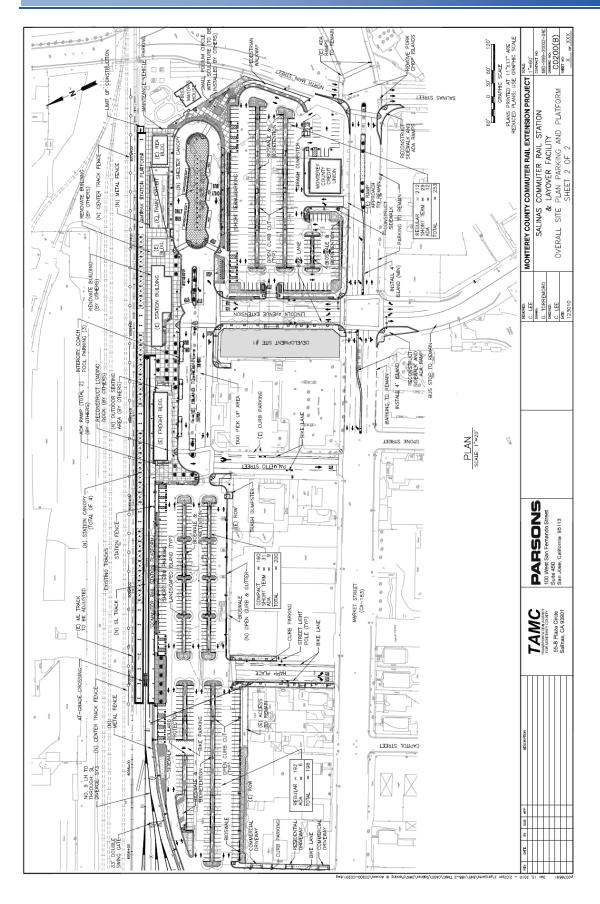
Salinas ITC Facility - Preliminary Design Layout
